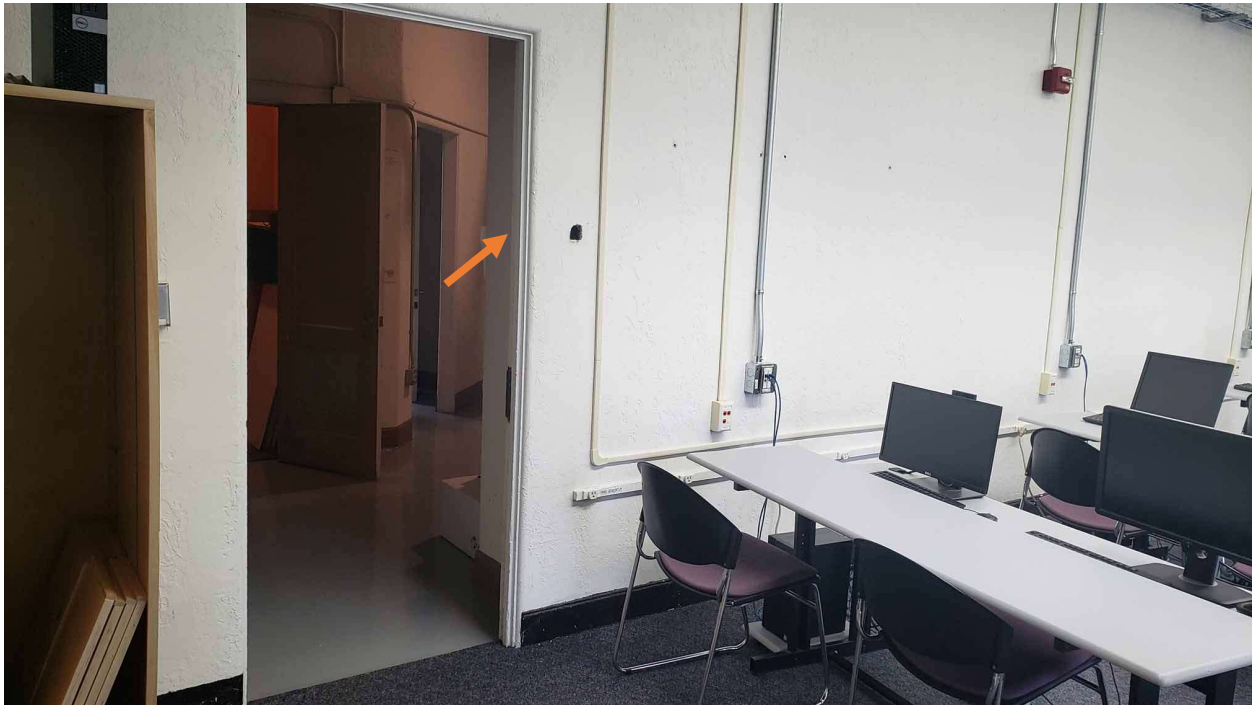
Door frame to hallway in Classroom 1 (sample Pb-36) contains LBP at a concentration of 1.4 mg/cm².
